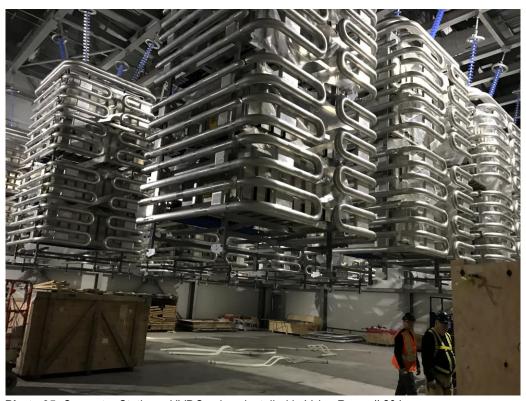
Converter Station – HVDC valves installed in Valve Room # 201.
